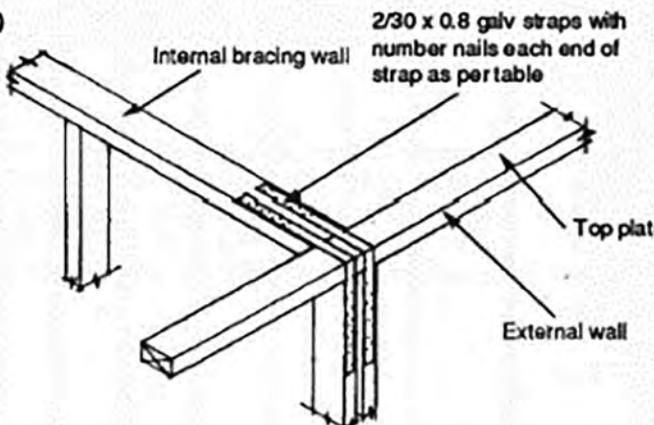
FIXING OF BRACING WALLS TO ROOF FRAME, OR TO EXTERNAL WALL FRAME		Design Strength (kN)
